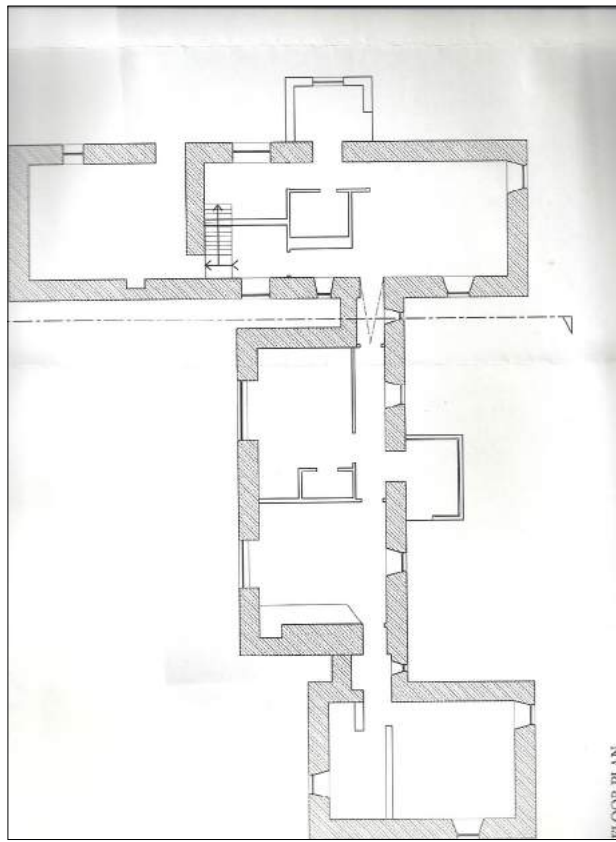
floor plan (drawn by Emma Gibb of Annie Kenyon Architects for Alistair Mutch).
